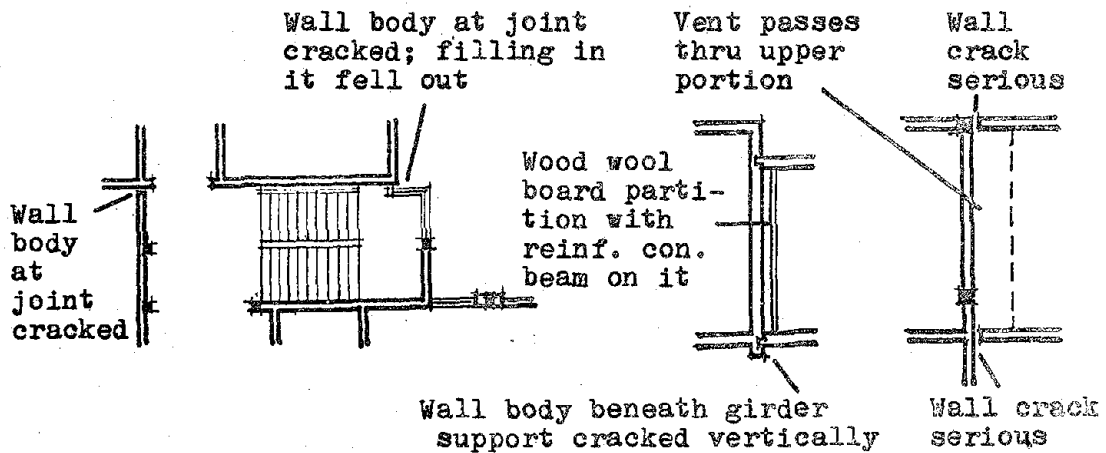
Damage conditions of junction at deformation joints built as single wall
